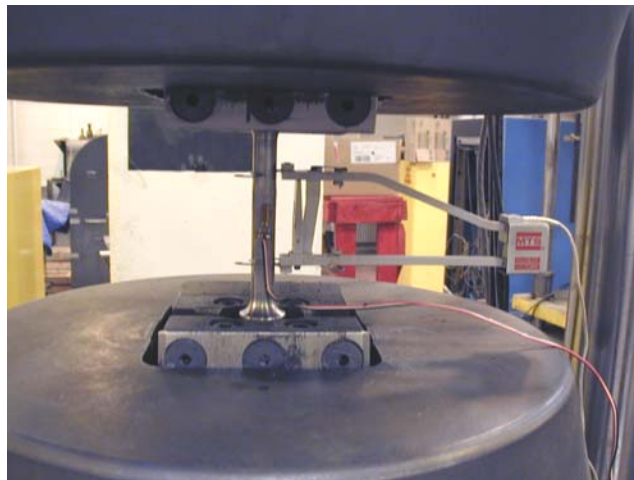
Tensile Coupon from Adams Mill Bridge in Grips of MTS Testing Machine before Testing
